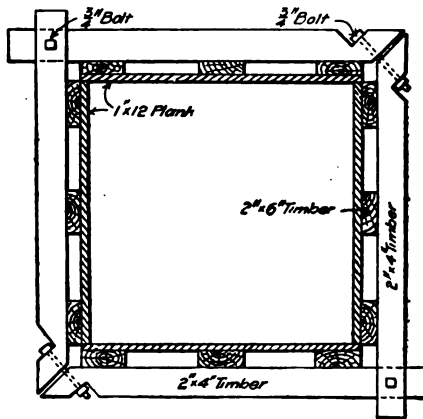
Column Form for Water Tower, Bordentown, N. J.
